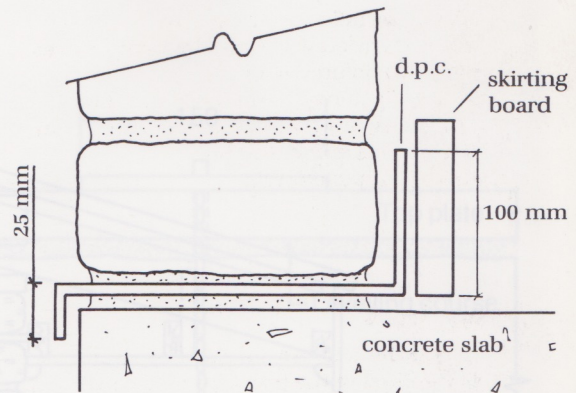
Detailing of damp-proof course when earth wall is placed directly on concrete slab.
